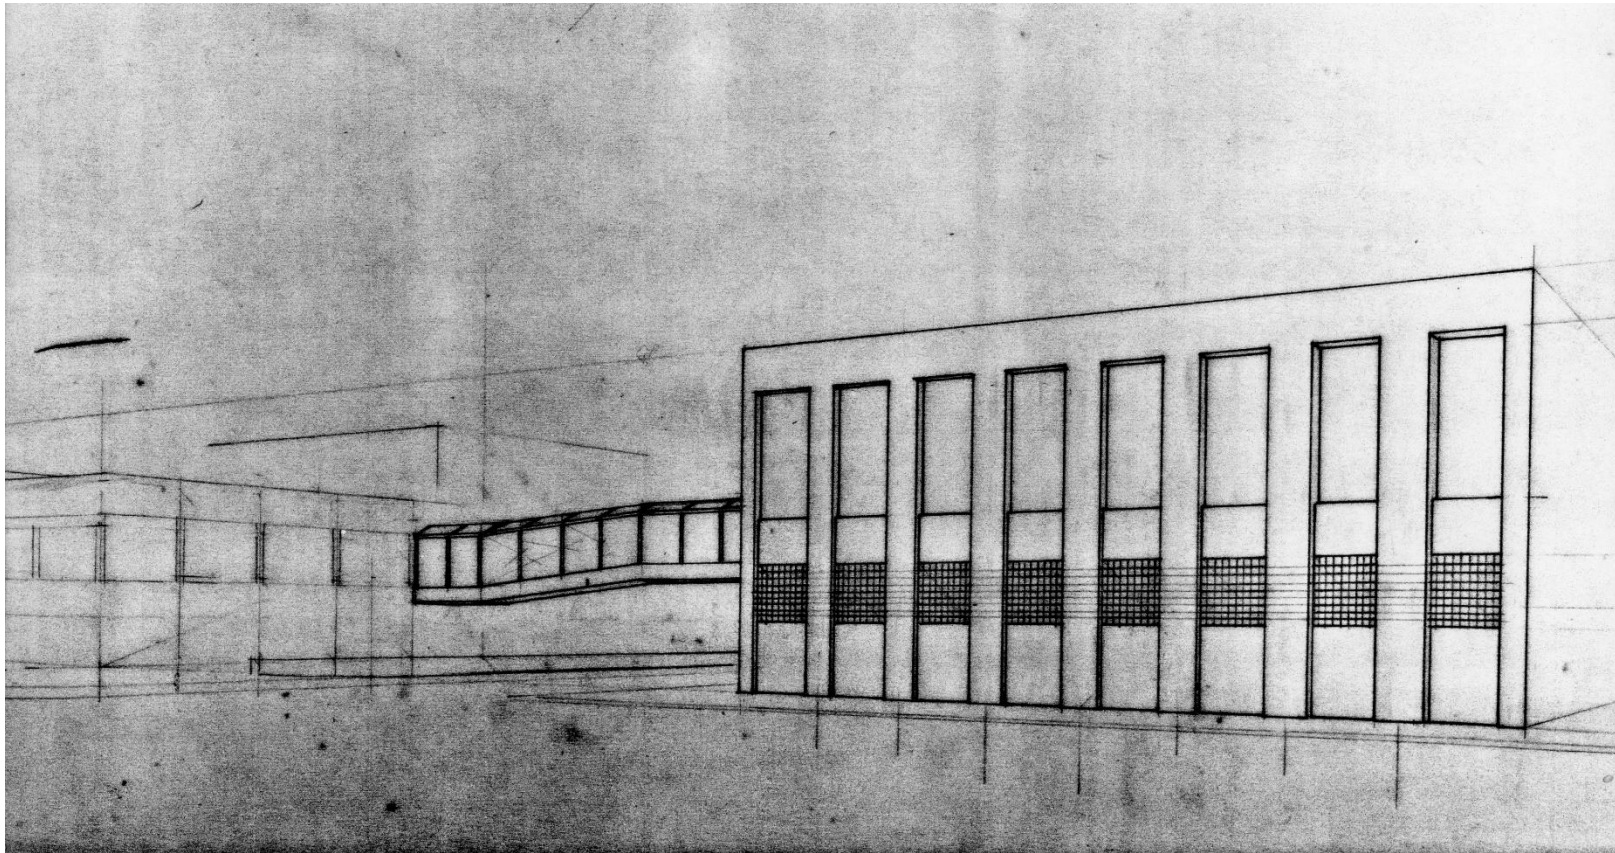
Isometric drawing of the proposed new addition onto the YMCA, 1984. This conceptual plan included a new swimming pool to be constructed along Cook Street, across the tracks to the west of the main facility (and connected to the main facility by an elevated pedestrian walkway over the railroad tracks).
